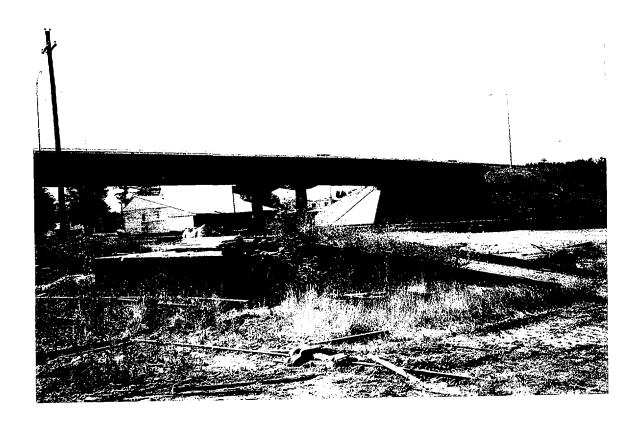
Loading Dock (east), north and west elevations, view to south/southeast
